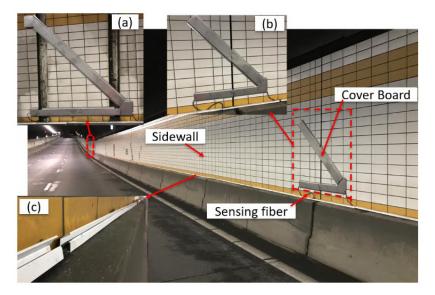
Sensor layout in First Heinnoord Tunnel at a) Immersion joint b) Expansion joint c) Loose fibre present in protective PVC duct (Xuehui and Broere, 2022)
